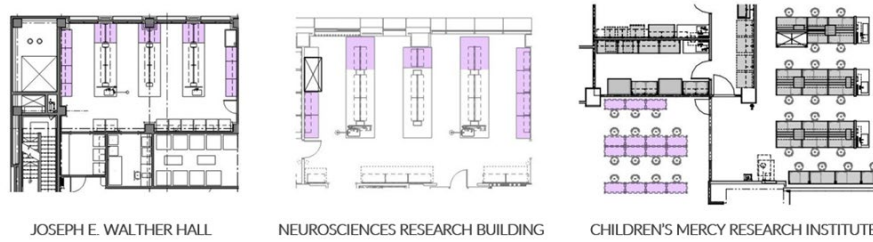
An example of lab workstations transitioning outside the laboratory environment within a typical floor plan.
